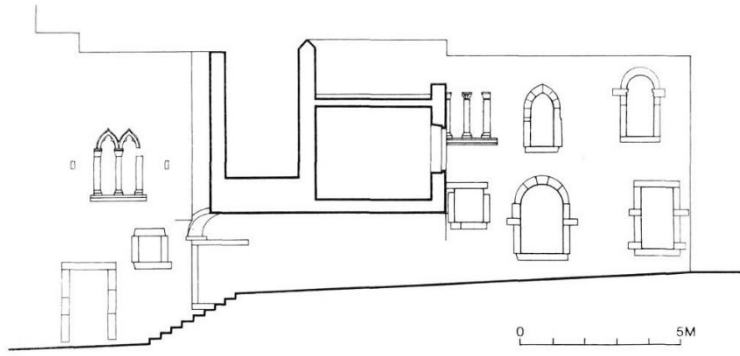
Example of the external staircase and residential vault above the street. Section and facade of Romanesque-Gothic palace in Kneza Krvaša Street, Dubrovnik. Plans reconstructed by Ivan Tenšek.
